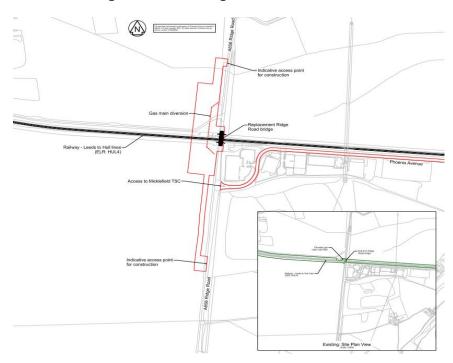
Site layout plan of the Replacement Ridge Road Bridge
